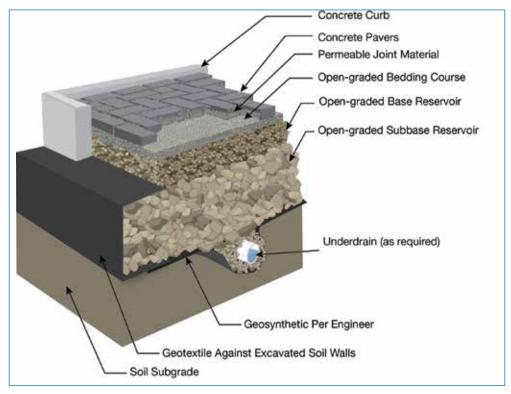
Permeable Interlocking Concrete Pavement (PICP)
